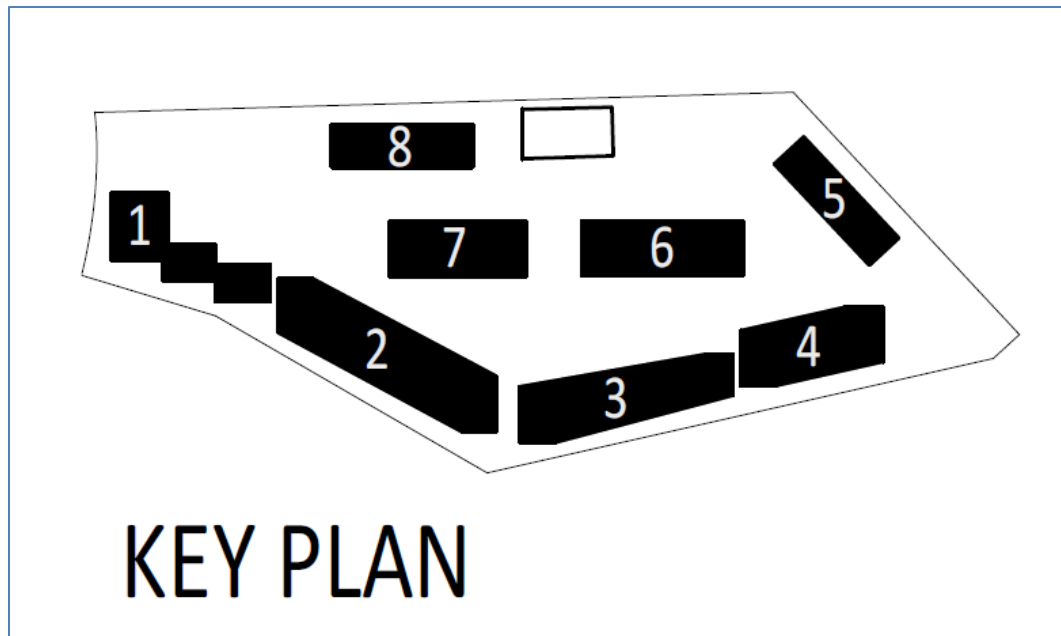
The proposal is to build six stacked dwelling buildings (Blocks 1,2,3,4,6,7) and two townhouse dwelling buildings (Blocks 5, 8).
